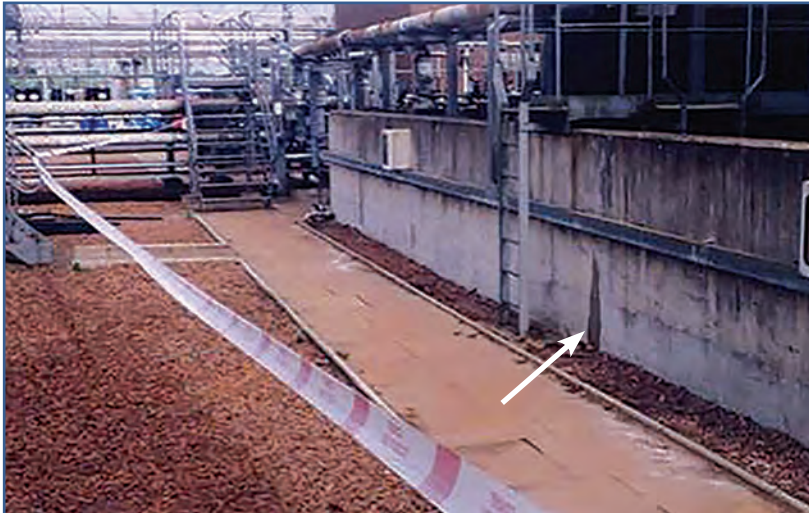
Arrow shows leaking crack in a bund wall (courtesy CH2M Hill, with permission from the Environment Agency)
